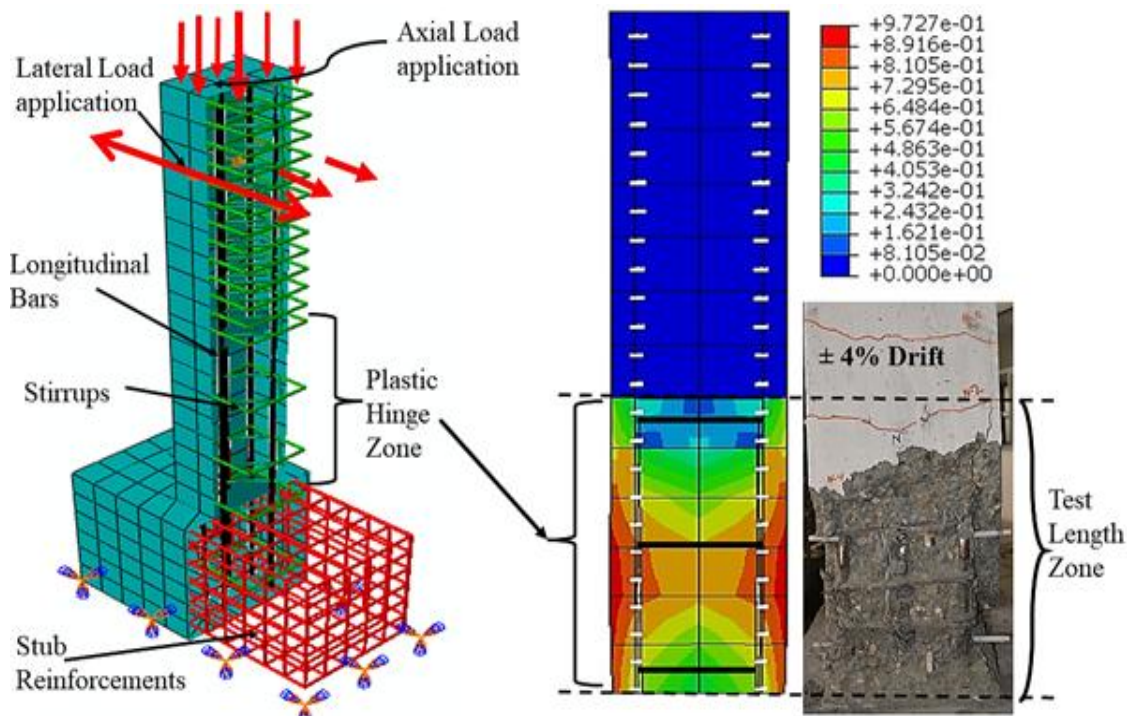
13 (a) 3D Model Schematic of Non-ductile Corroded Column with Reinforcement Details
